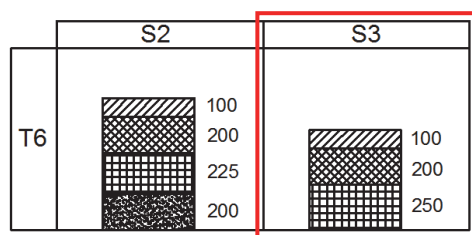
Pavement Structure of Road (Myawaddy to Thatong)
